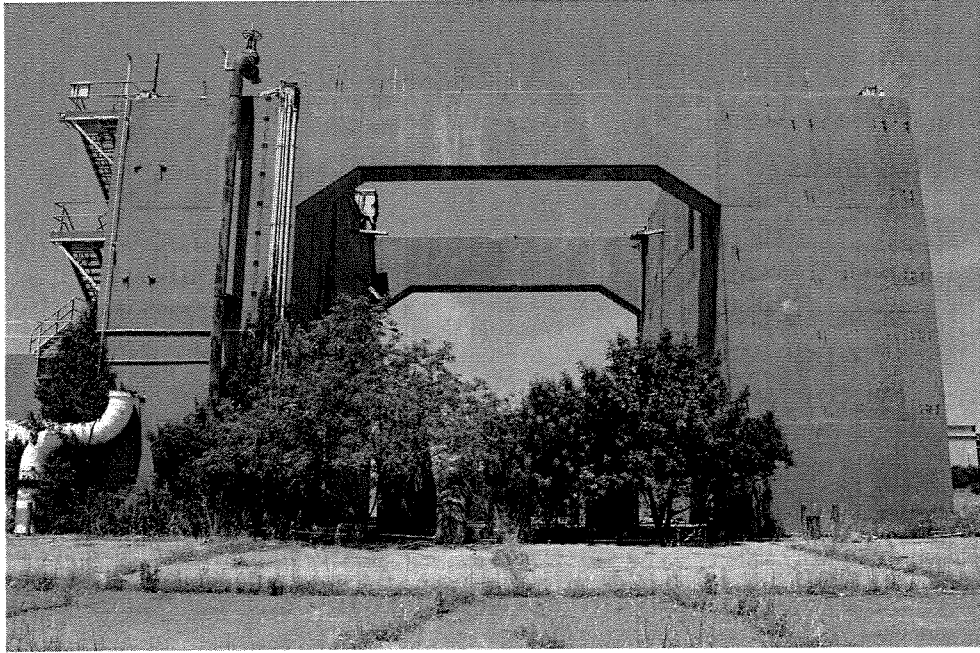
Test Stand No. 3 (Unit 131), Beta Test Complex, 1963-1964. Looking northeast. View of May 2005.
